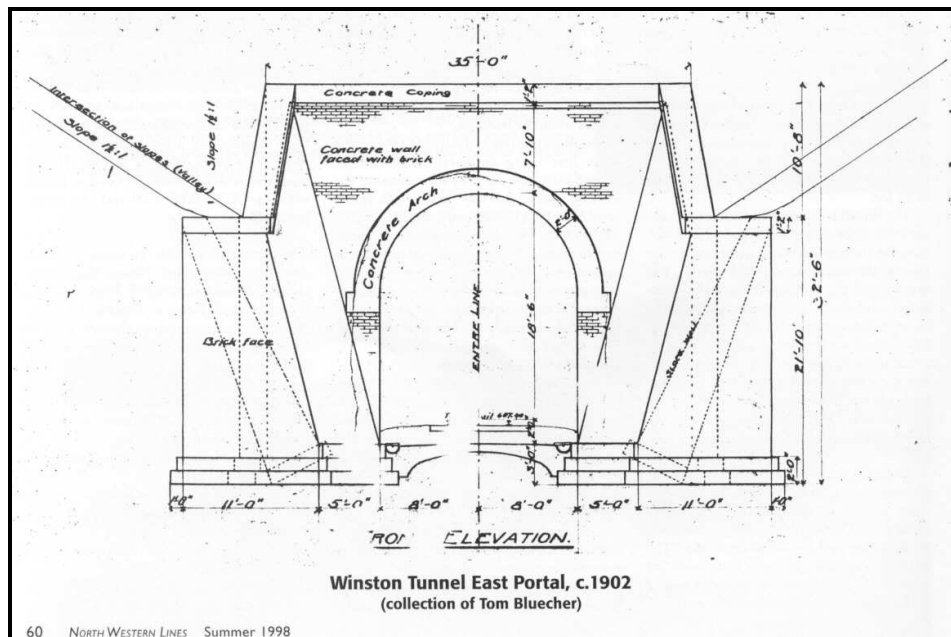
Elevation plan for the east portal to the Winston Tunnel. The portal was faced with brick and concrete was used for the arch and coping (Huddleston 1998:60).
